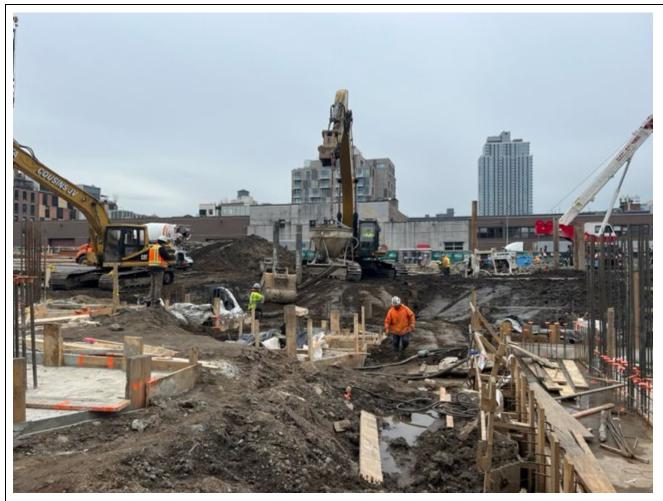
View facing south, CCJV preparing to pour concrete into foundation footings in grid cell SC-8.
